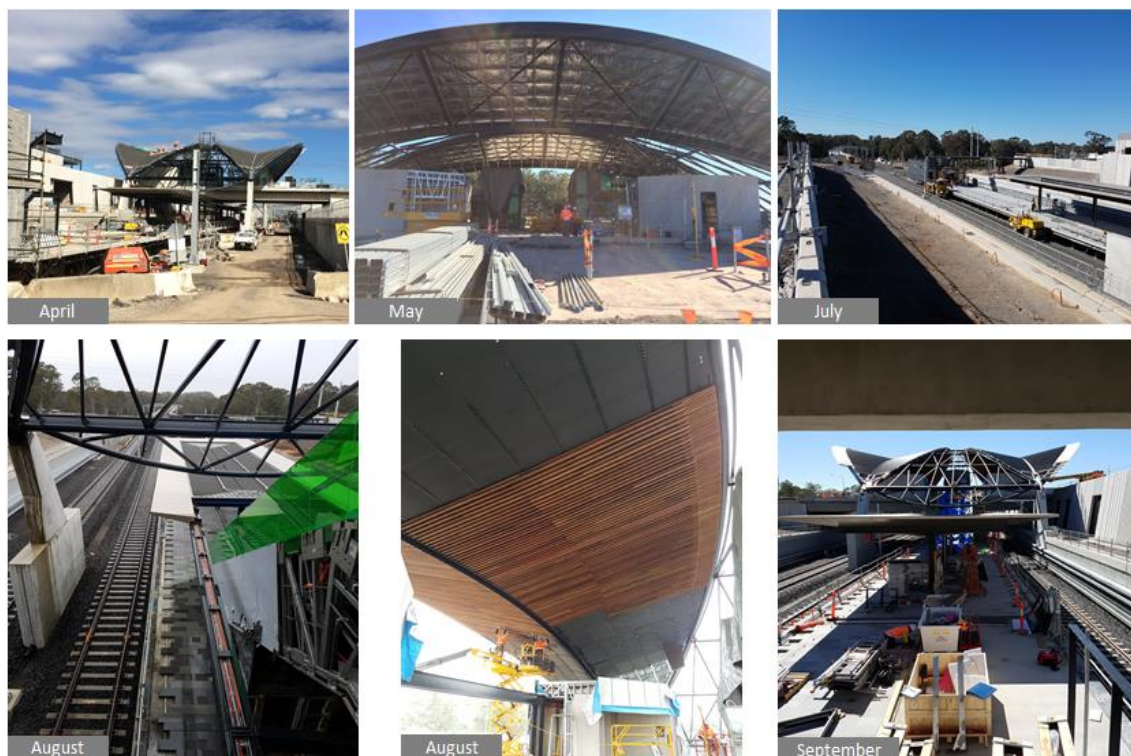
Construction work being carried out at Cudgong Road Station during the reporting period
